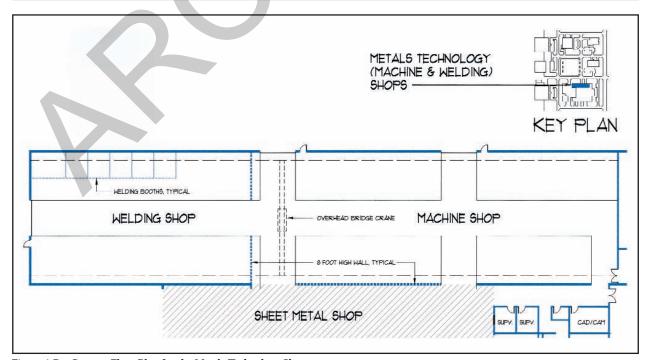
B: Concept Floor Plan for the Metals Technology Shops.
